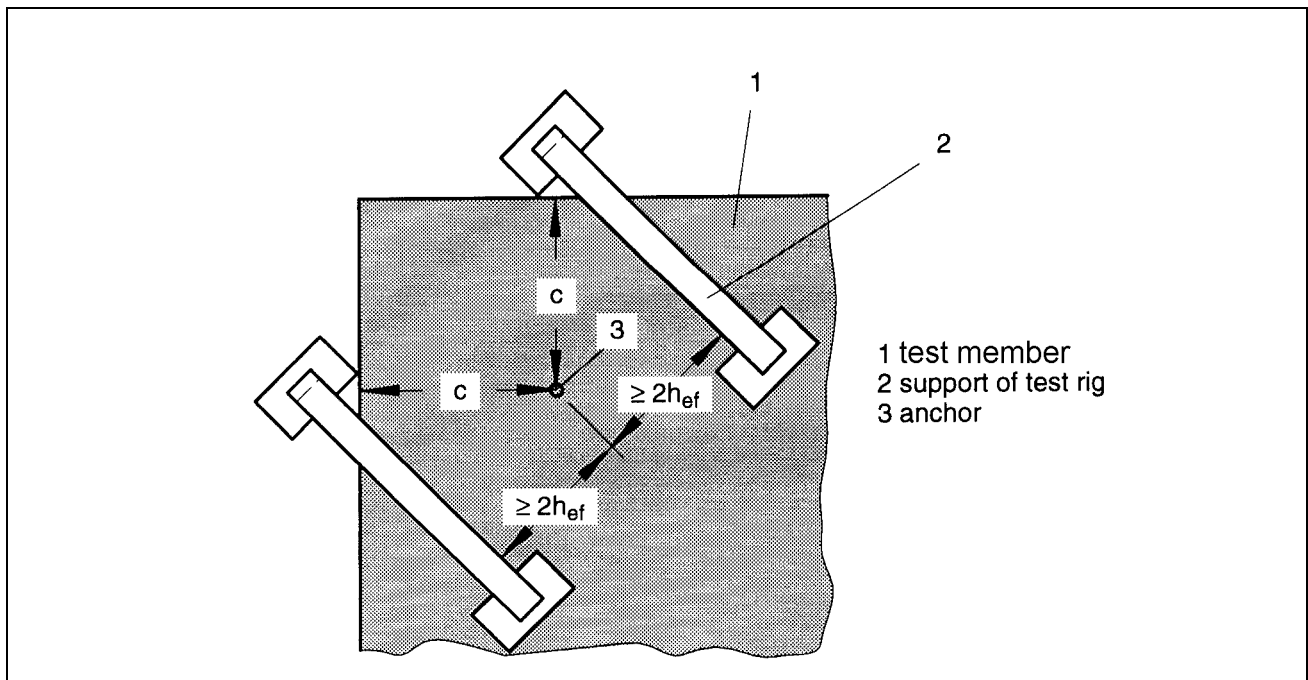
Example of the test rig for tension tests on plastic anchors at a corner
